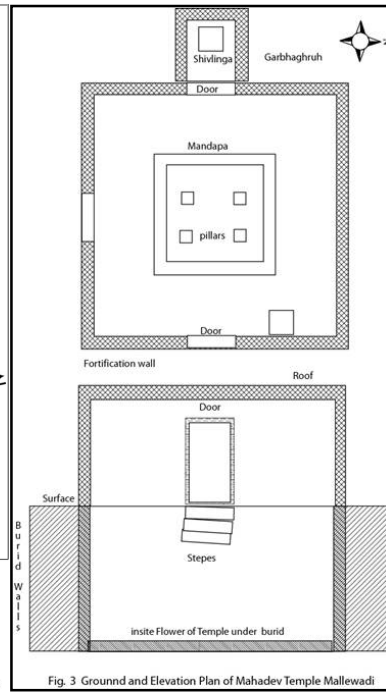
Ground and Elevation Plan of Mahadev Temple Mallewadi
